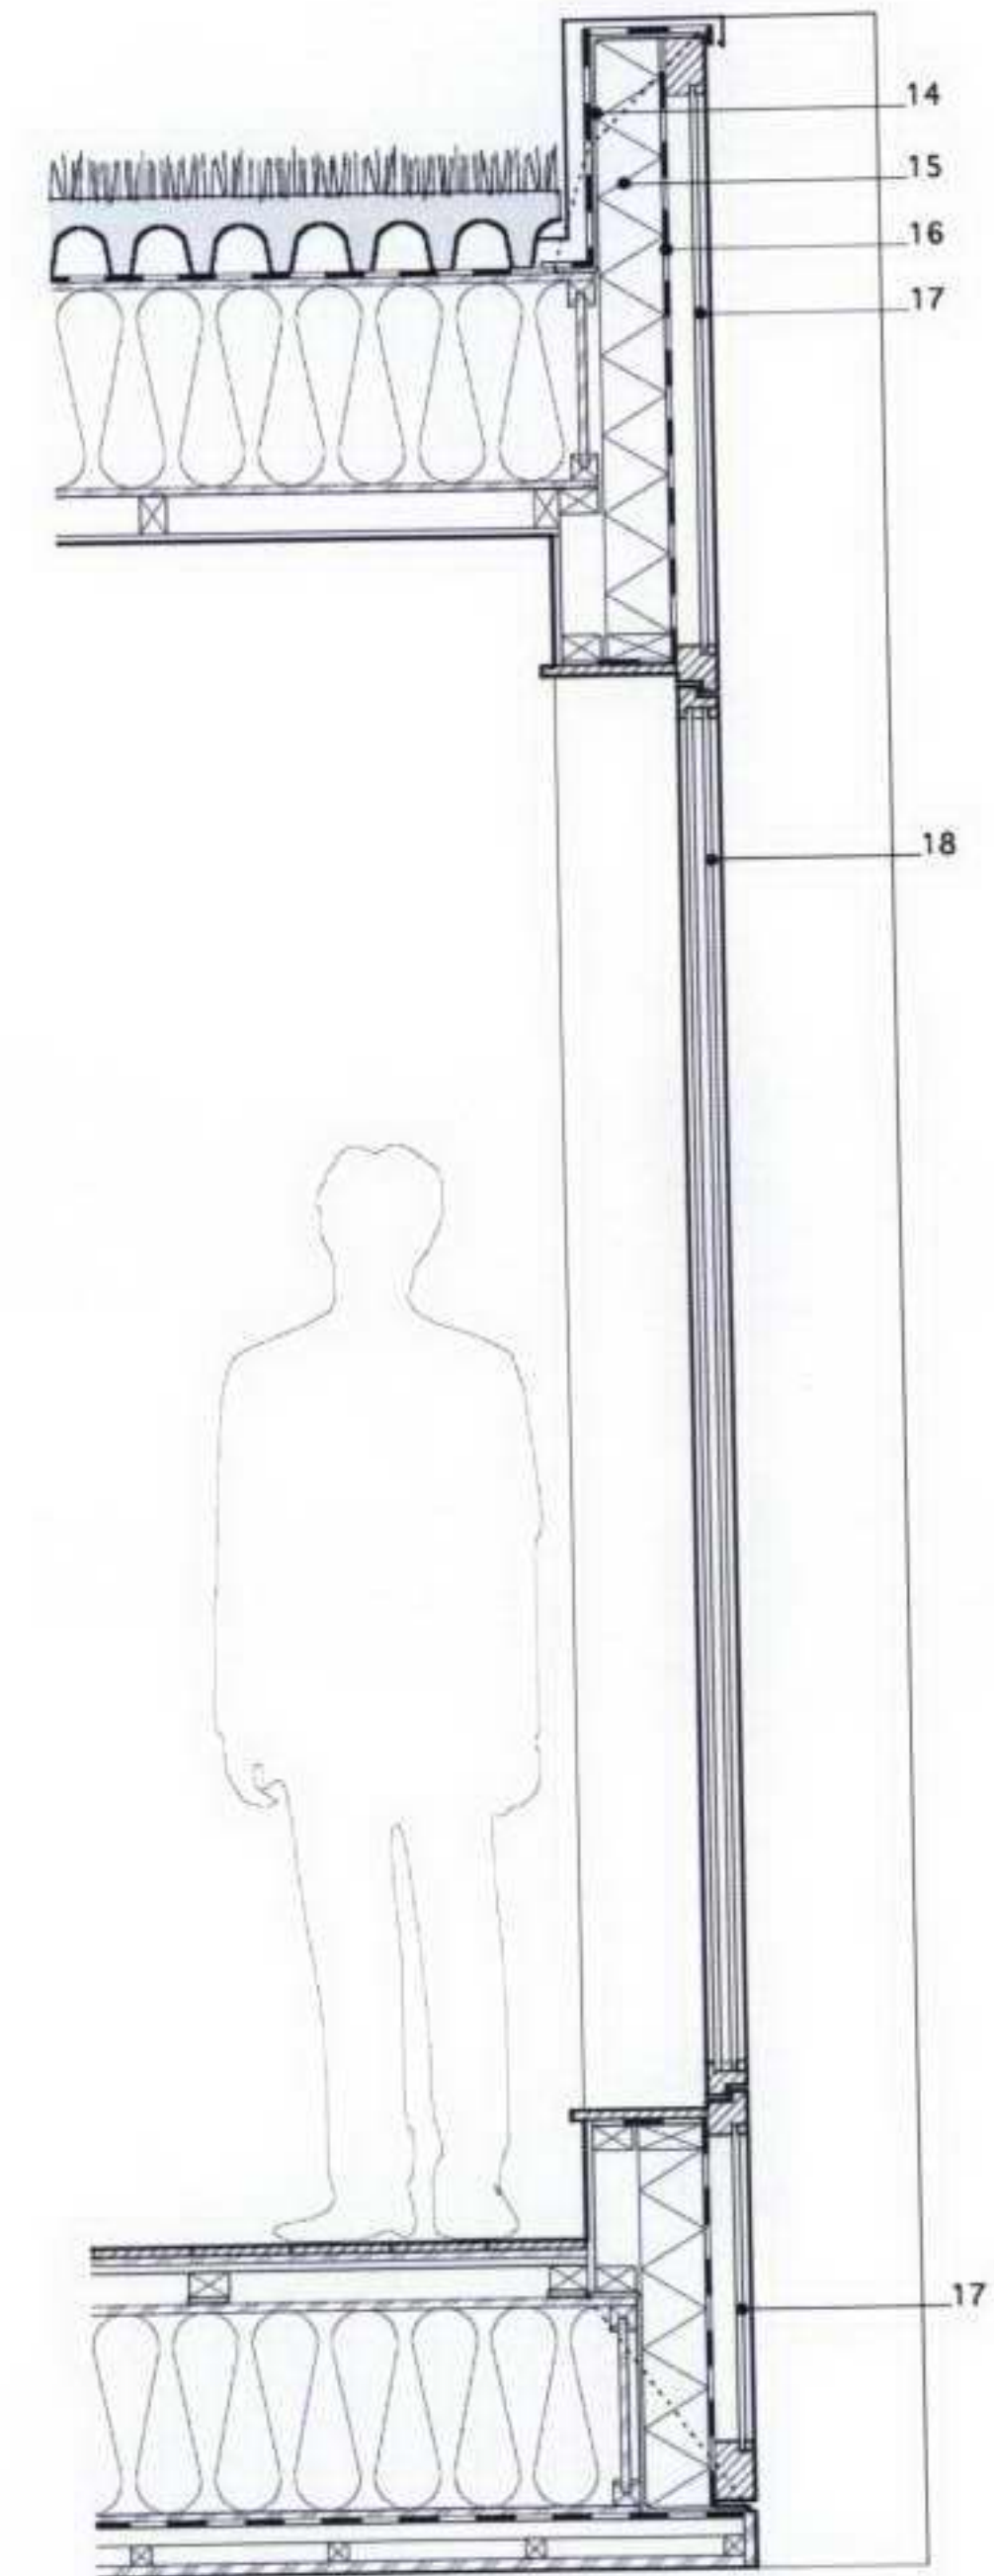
Detail section through a typical window showing the 200mm cill height.
